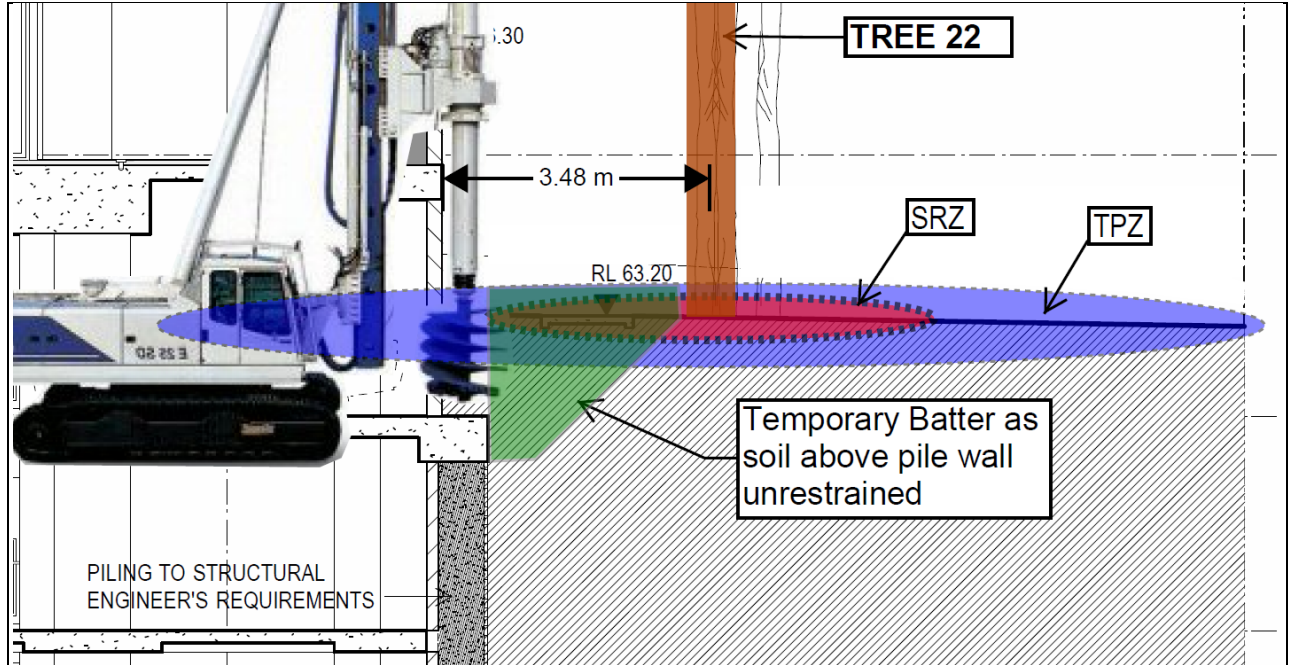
Shows the SRZ and TPZ of T22 and the likely encroachments dues to piling and excavation batter. Drawing ref.A_B 232, Section BB, marked up by C. Mackenzie. Drawing not to scale.
